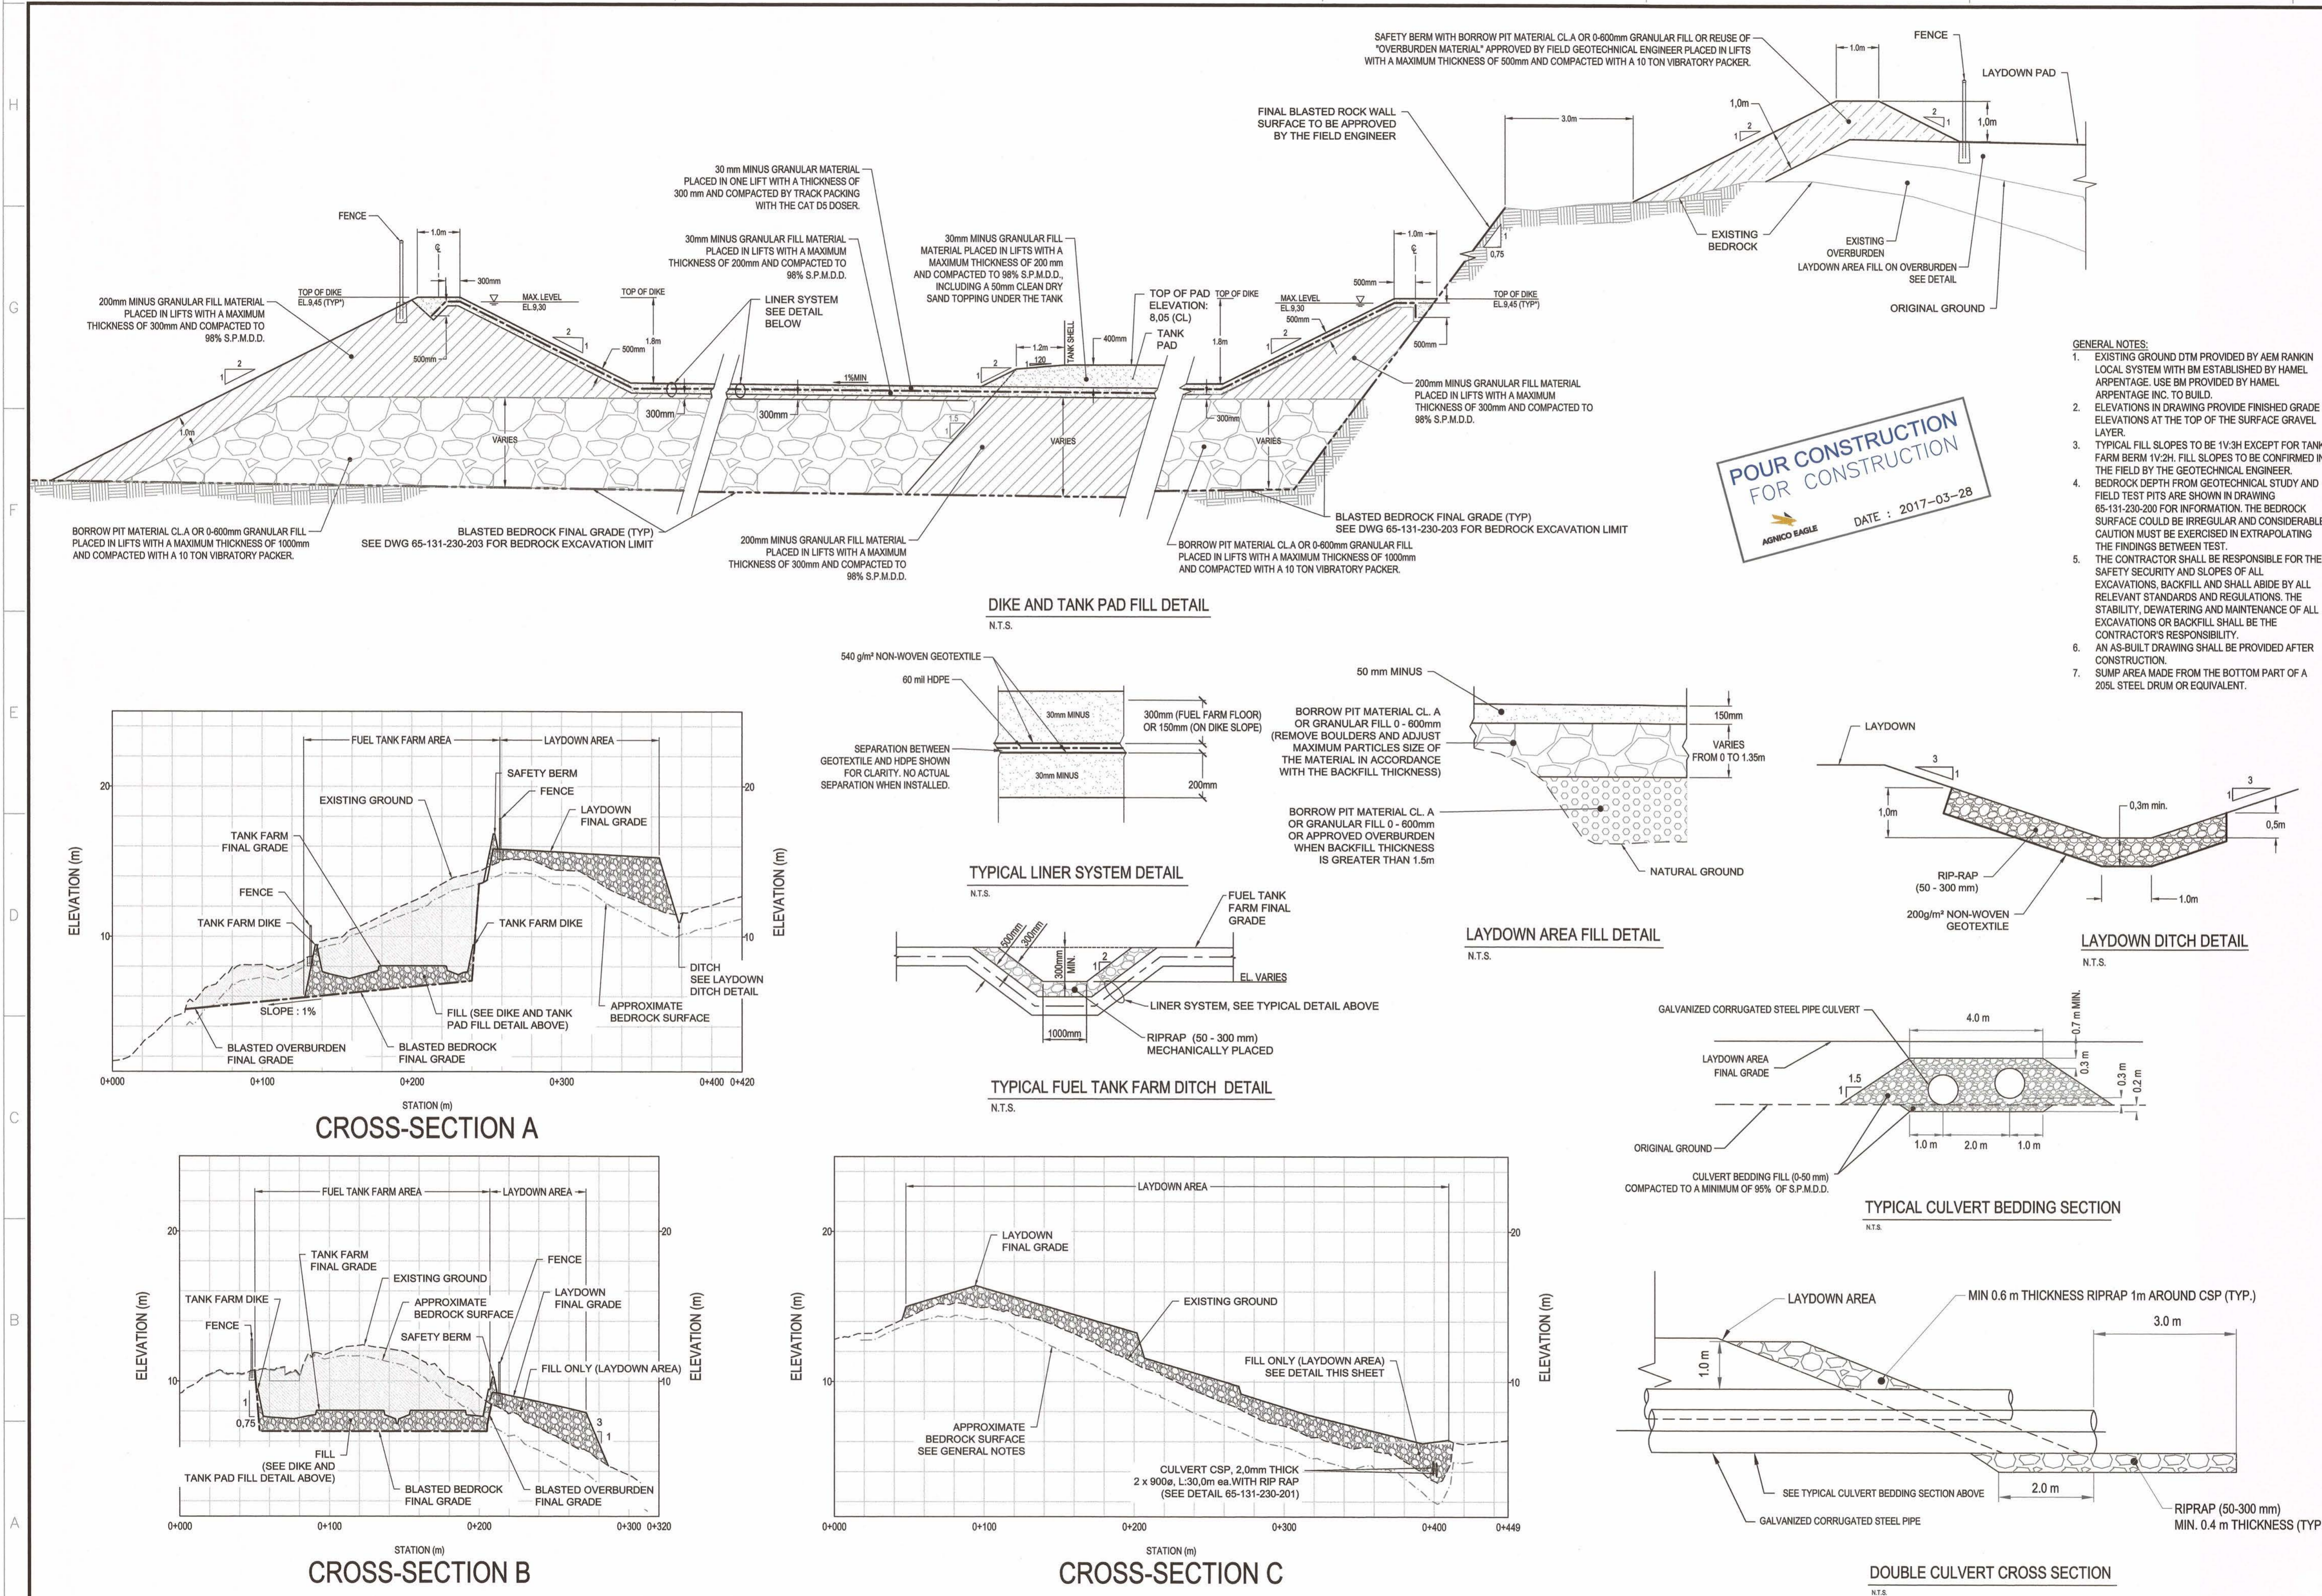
Detailed view - location of Itivia laydown area and culvert
